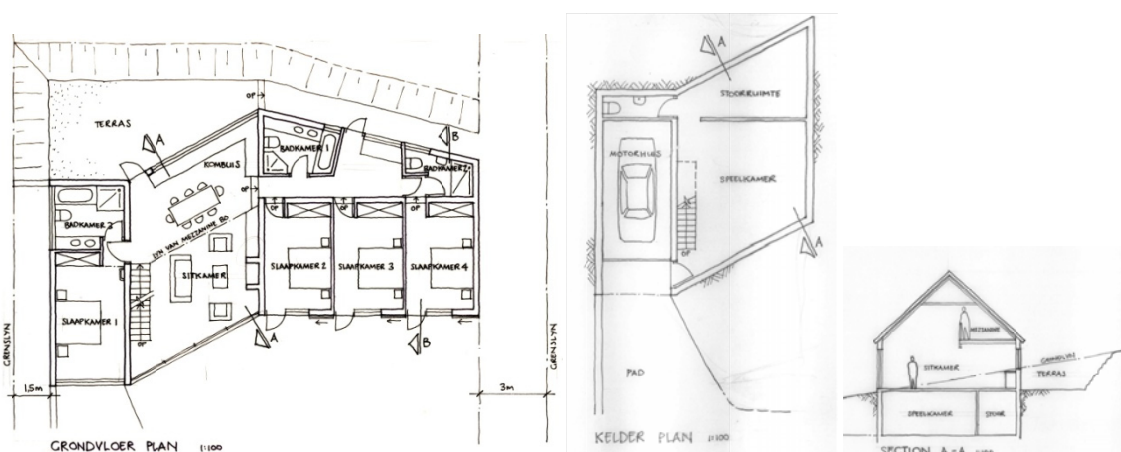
House Fagan in McGregor (2005). Left: Ground floor plan. Middle: Lower ground floor plan. Right: Section (all Fagan archive - Job No. 0507, 23/09/2005).
